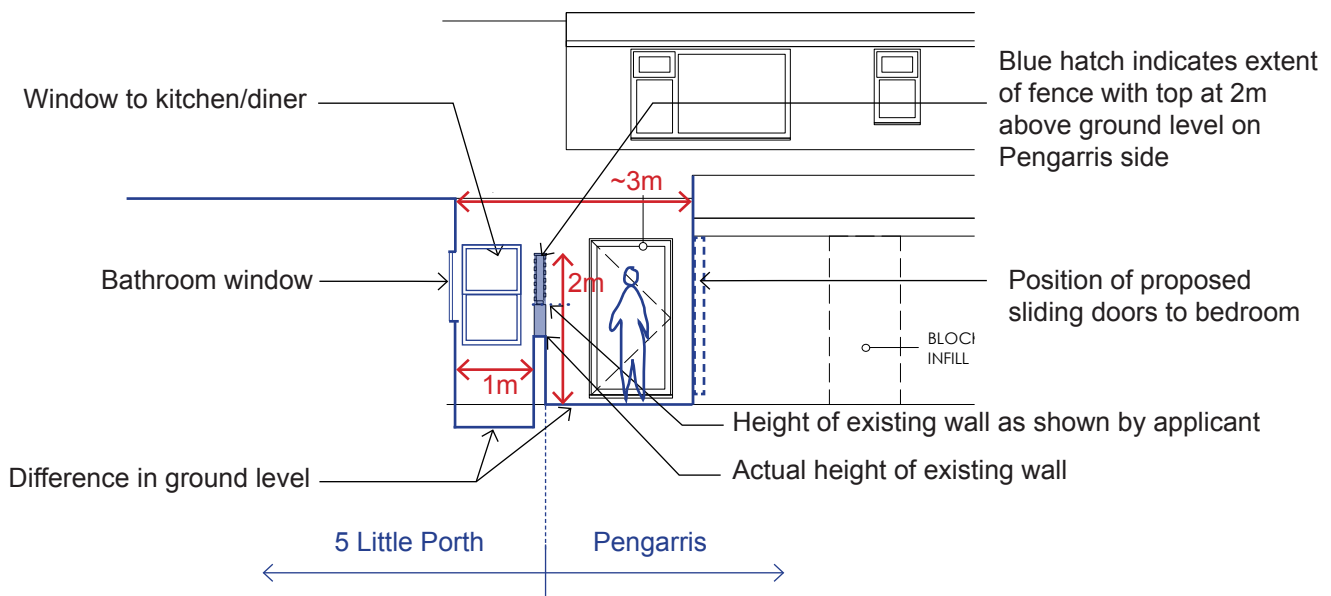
Mark-up of applicant's proposed elevation showing the correct existing wall height and position of existing adjacent windows in 5 Little Porth. Additional drawing is shown in blue.
